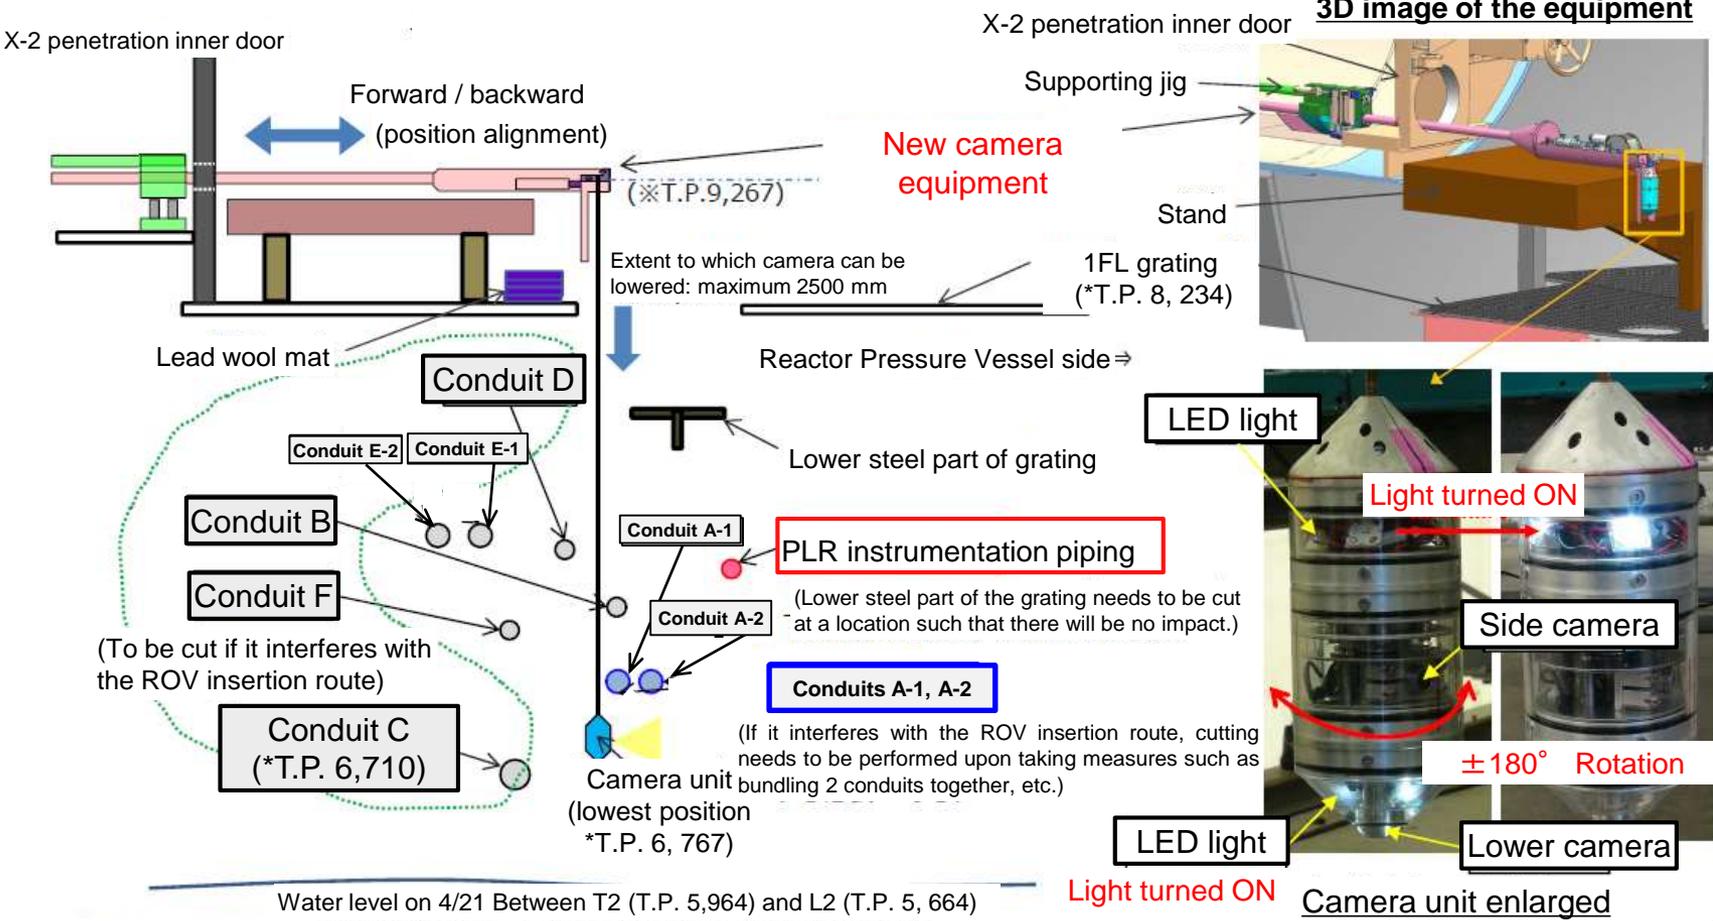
(3)(v)-1 Conduit cutting plan
